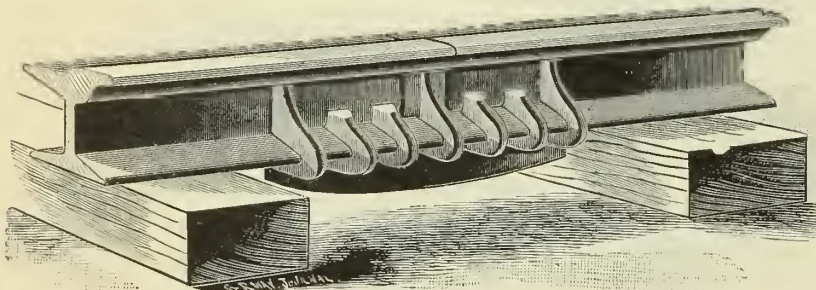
RAIL JOINT BRIDGE IN POSITION.
